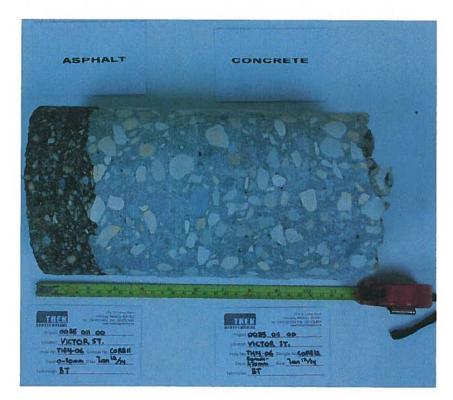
Asphalt and Concrete Core Sample from Test Hole TH14-06
